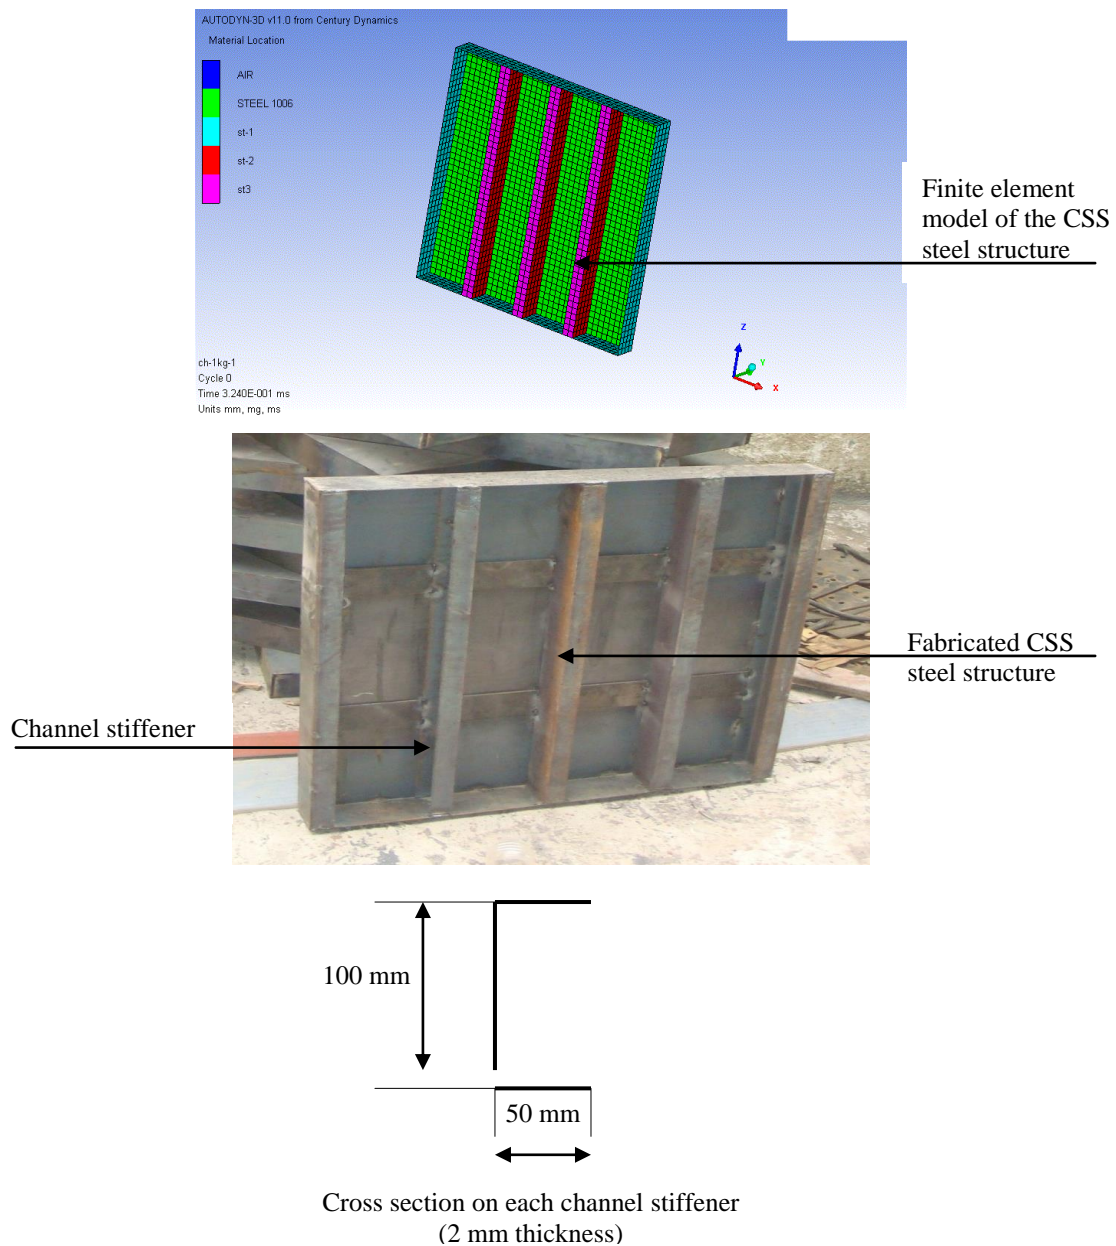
Assembled channel stiffener sandwich steel structure (CSS)
